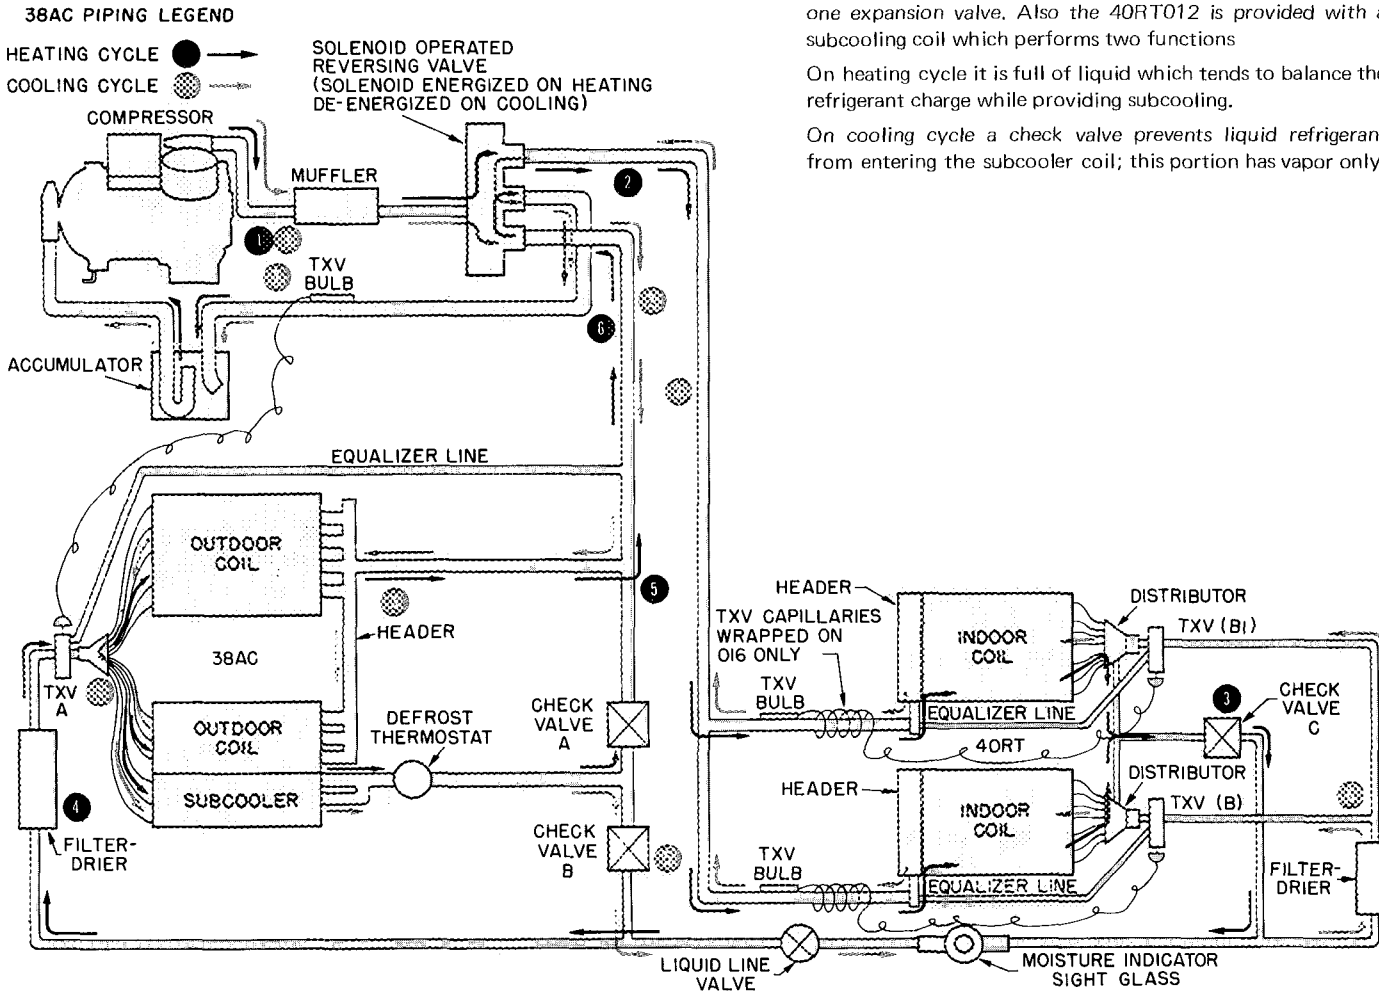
Heat Pump Cycle (Heating and Cooling)
